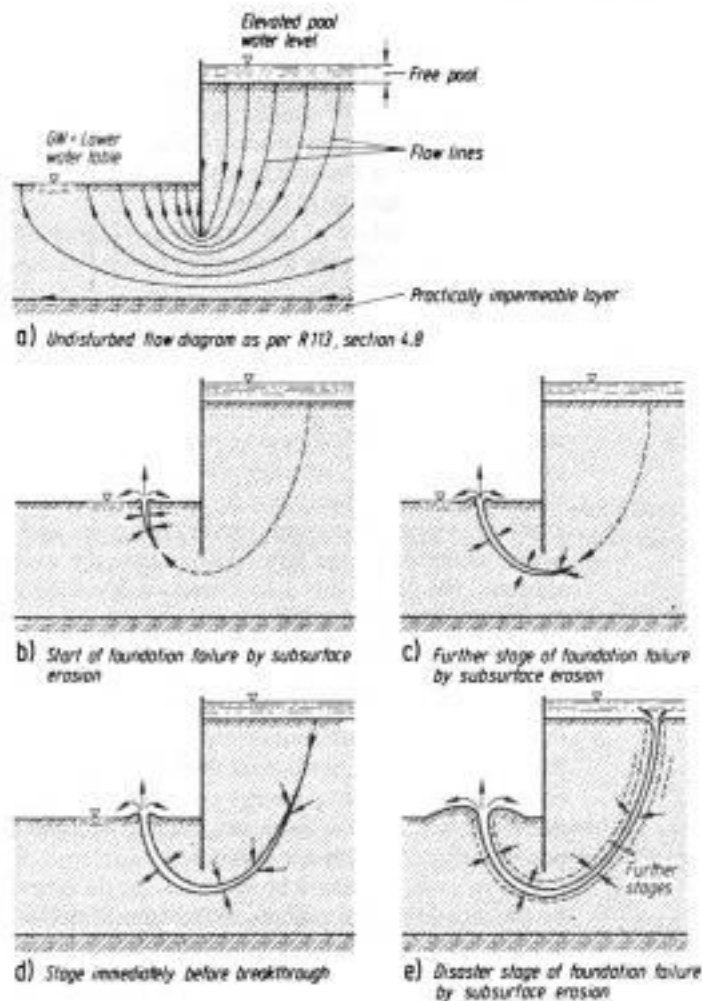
Development of foundation failure by subsurface erosion²⁹
